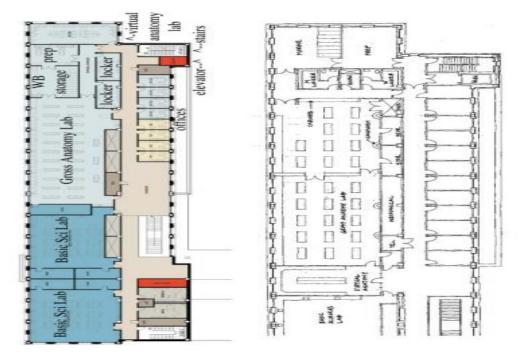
Floor Plans for First Phase Renovation at Washington School of Medicine. Source: Co Architects, 2016
